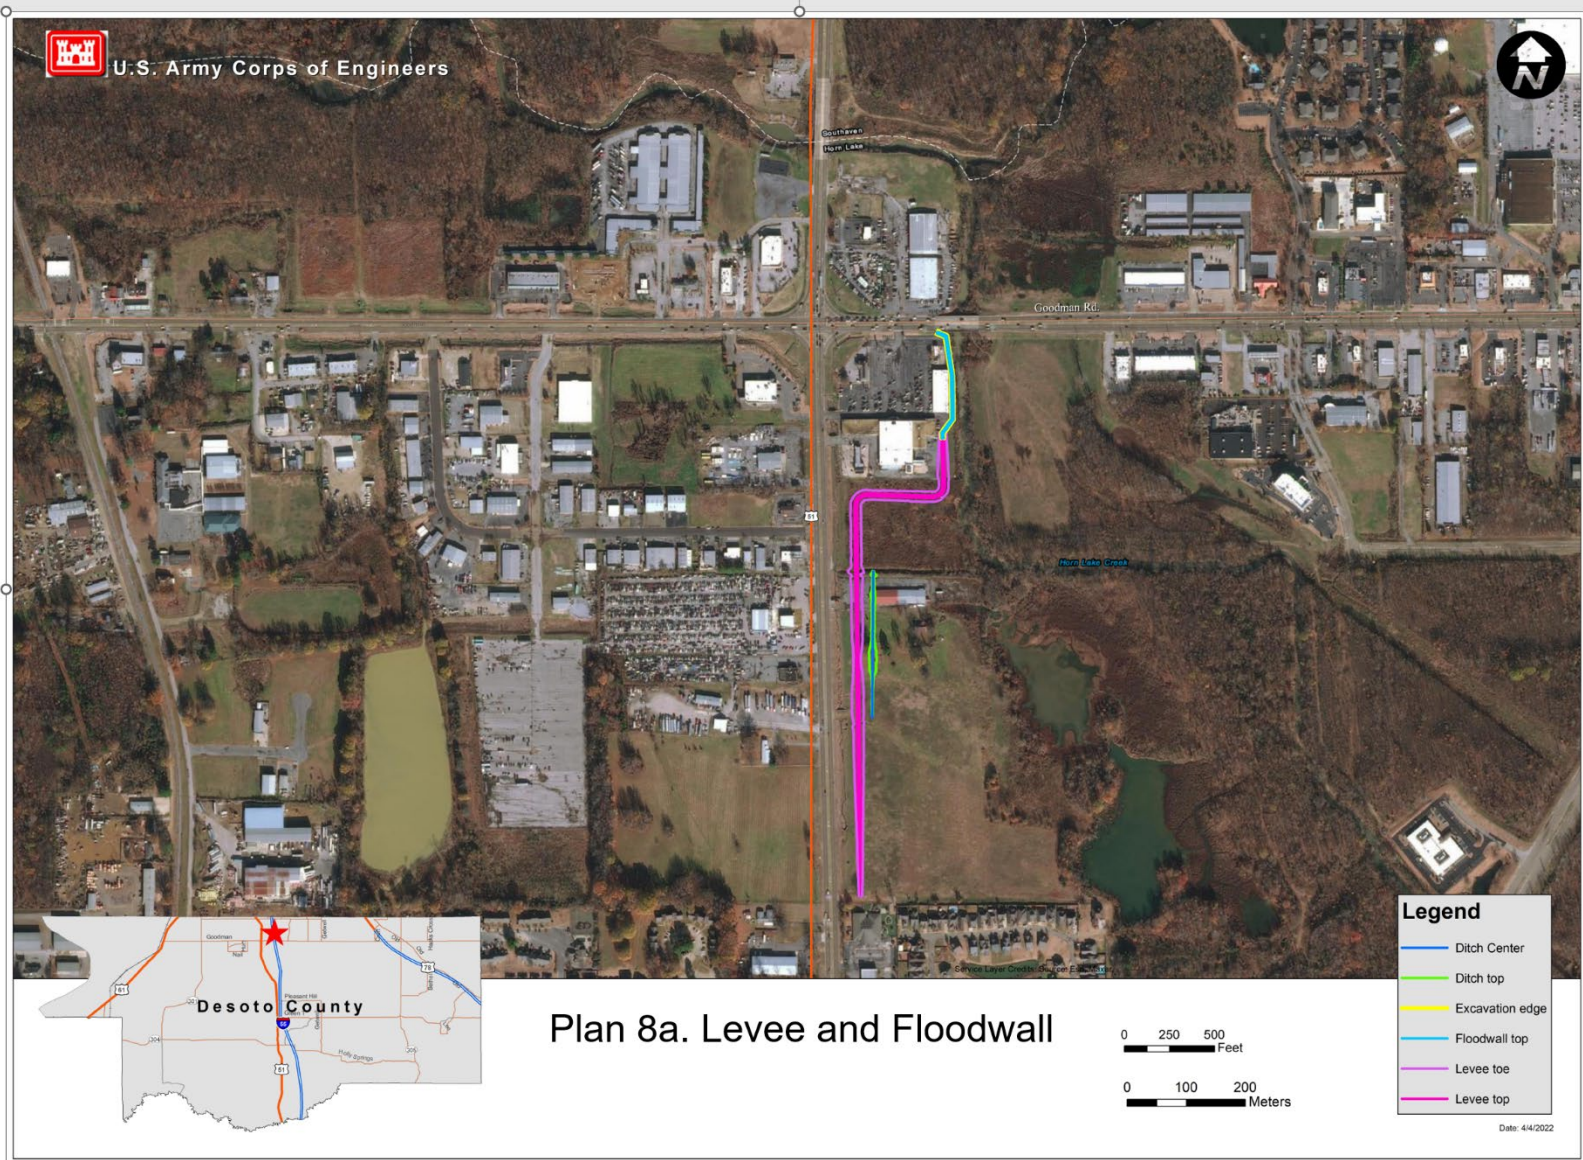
Final Array Plan 8a. Levee and Floodwall
